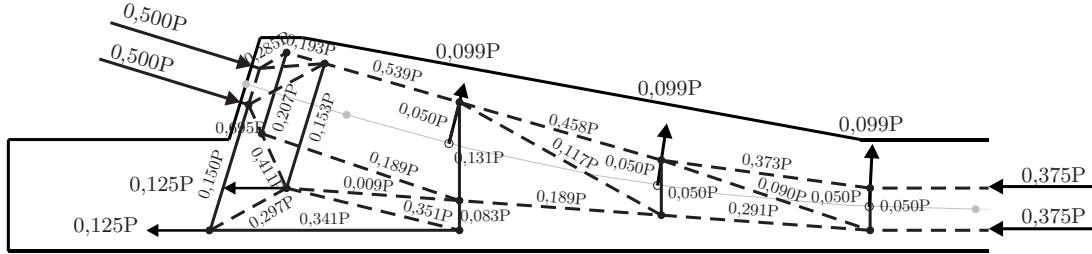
Strut and tie model - Section A-A (detail of the anchorage zone)
